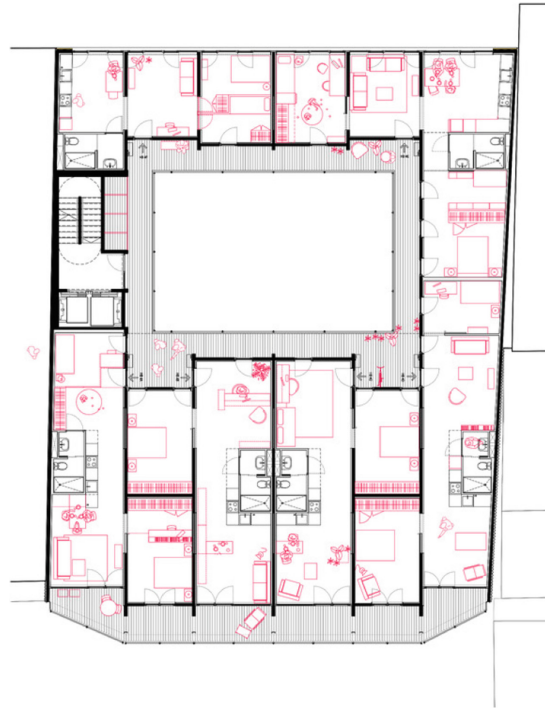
La Borda, first-floor plan. To the north is a large sharing space, the laundry, shared toilet and storage space. To the south are the dwelling units. Source: Courtesy of Lacol. [<https://www.archdaily.cn/cn/922487/xi-ban-ya-la-bordazhu-zhai-tan-suo-ji-ti-zi-fa-zhu-zhai-de-ke-neng-xing-lacol>]
